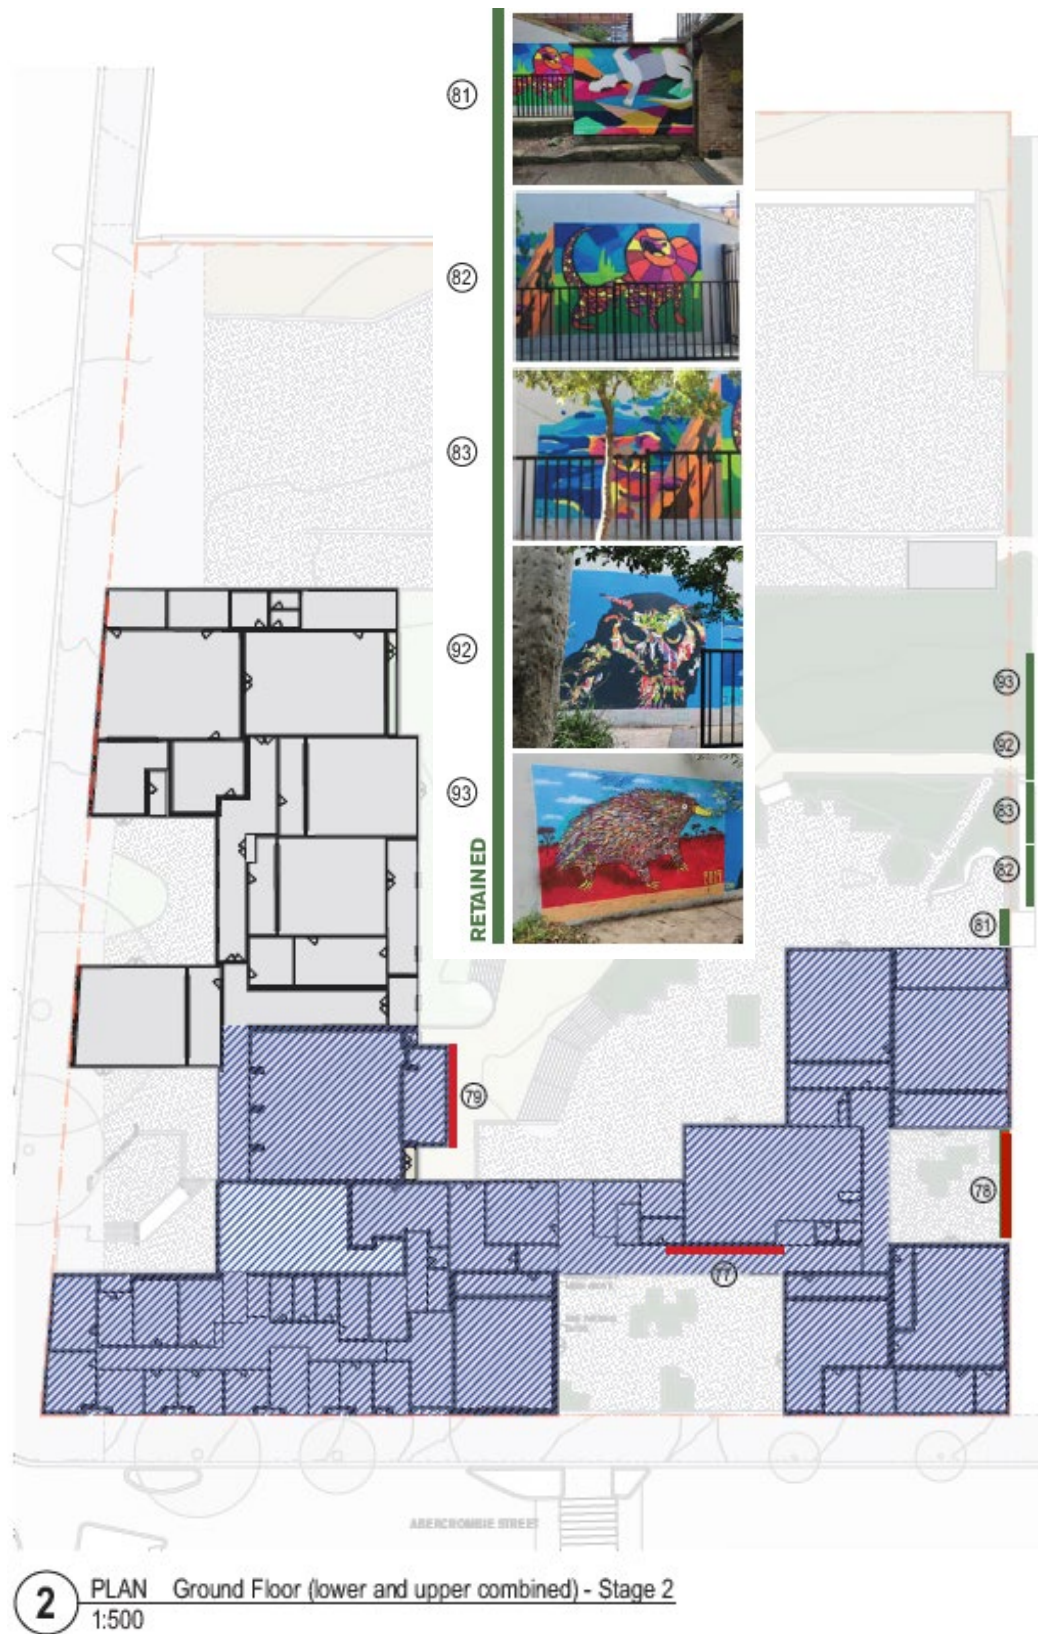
Brick Mural Demolition Plans, Stage Two, showing retained Painted Wall Murals. (Source FJMT 2020)
